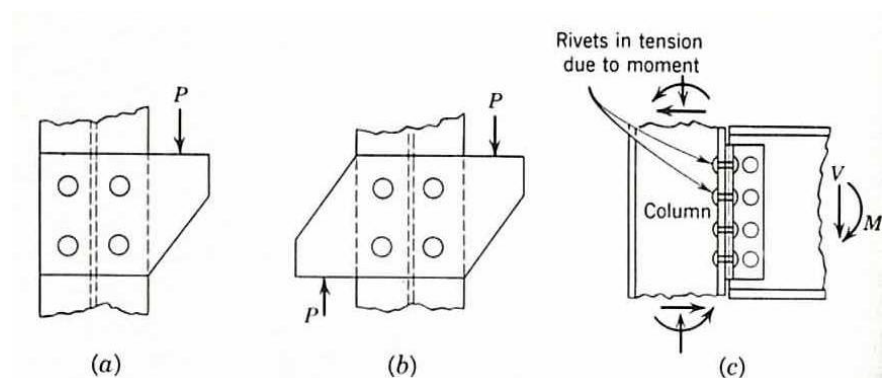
Types of riveted connections: a) Eccentric load connection, b) Pure moment connection, c) Shear-moment connection (Bresler et al., 1960).
